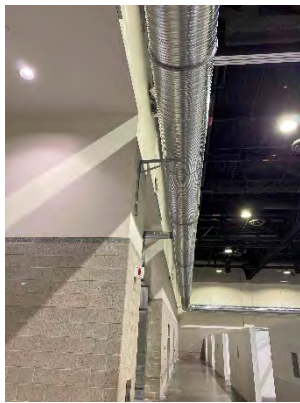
Exhaust System – Typical Sway Bracing Provided by Brackets or Diagonal Cable Stays
